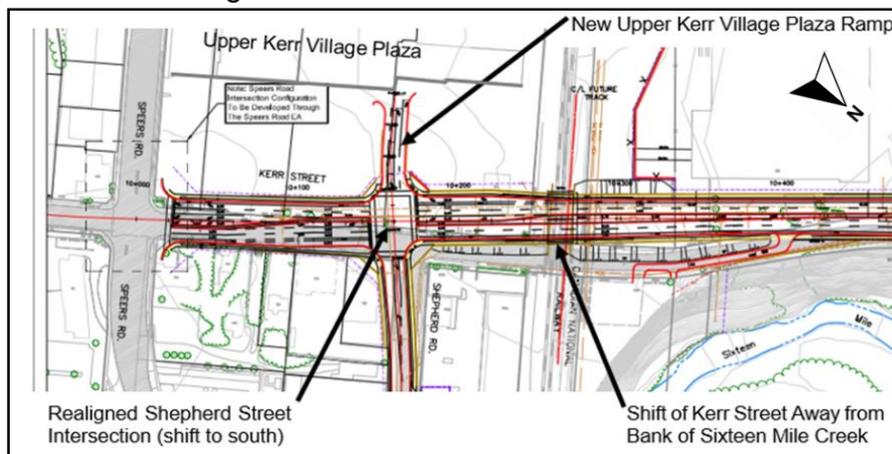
Plan Illustrating Alignment of Kerr Street and Access to Subject Lands
